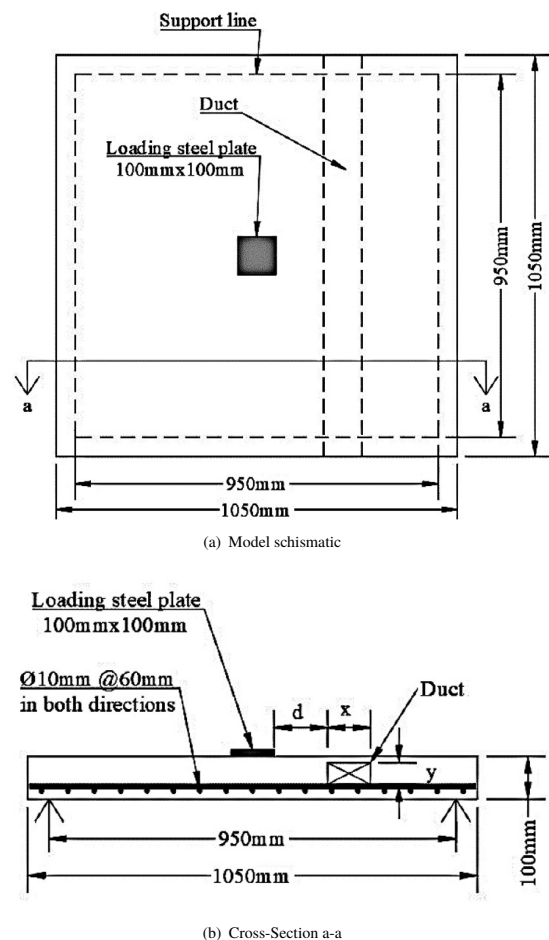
Dimensions of the tested specimen and details of reinforcement.
